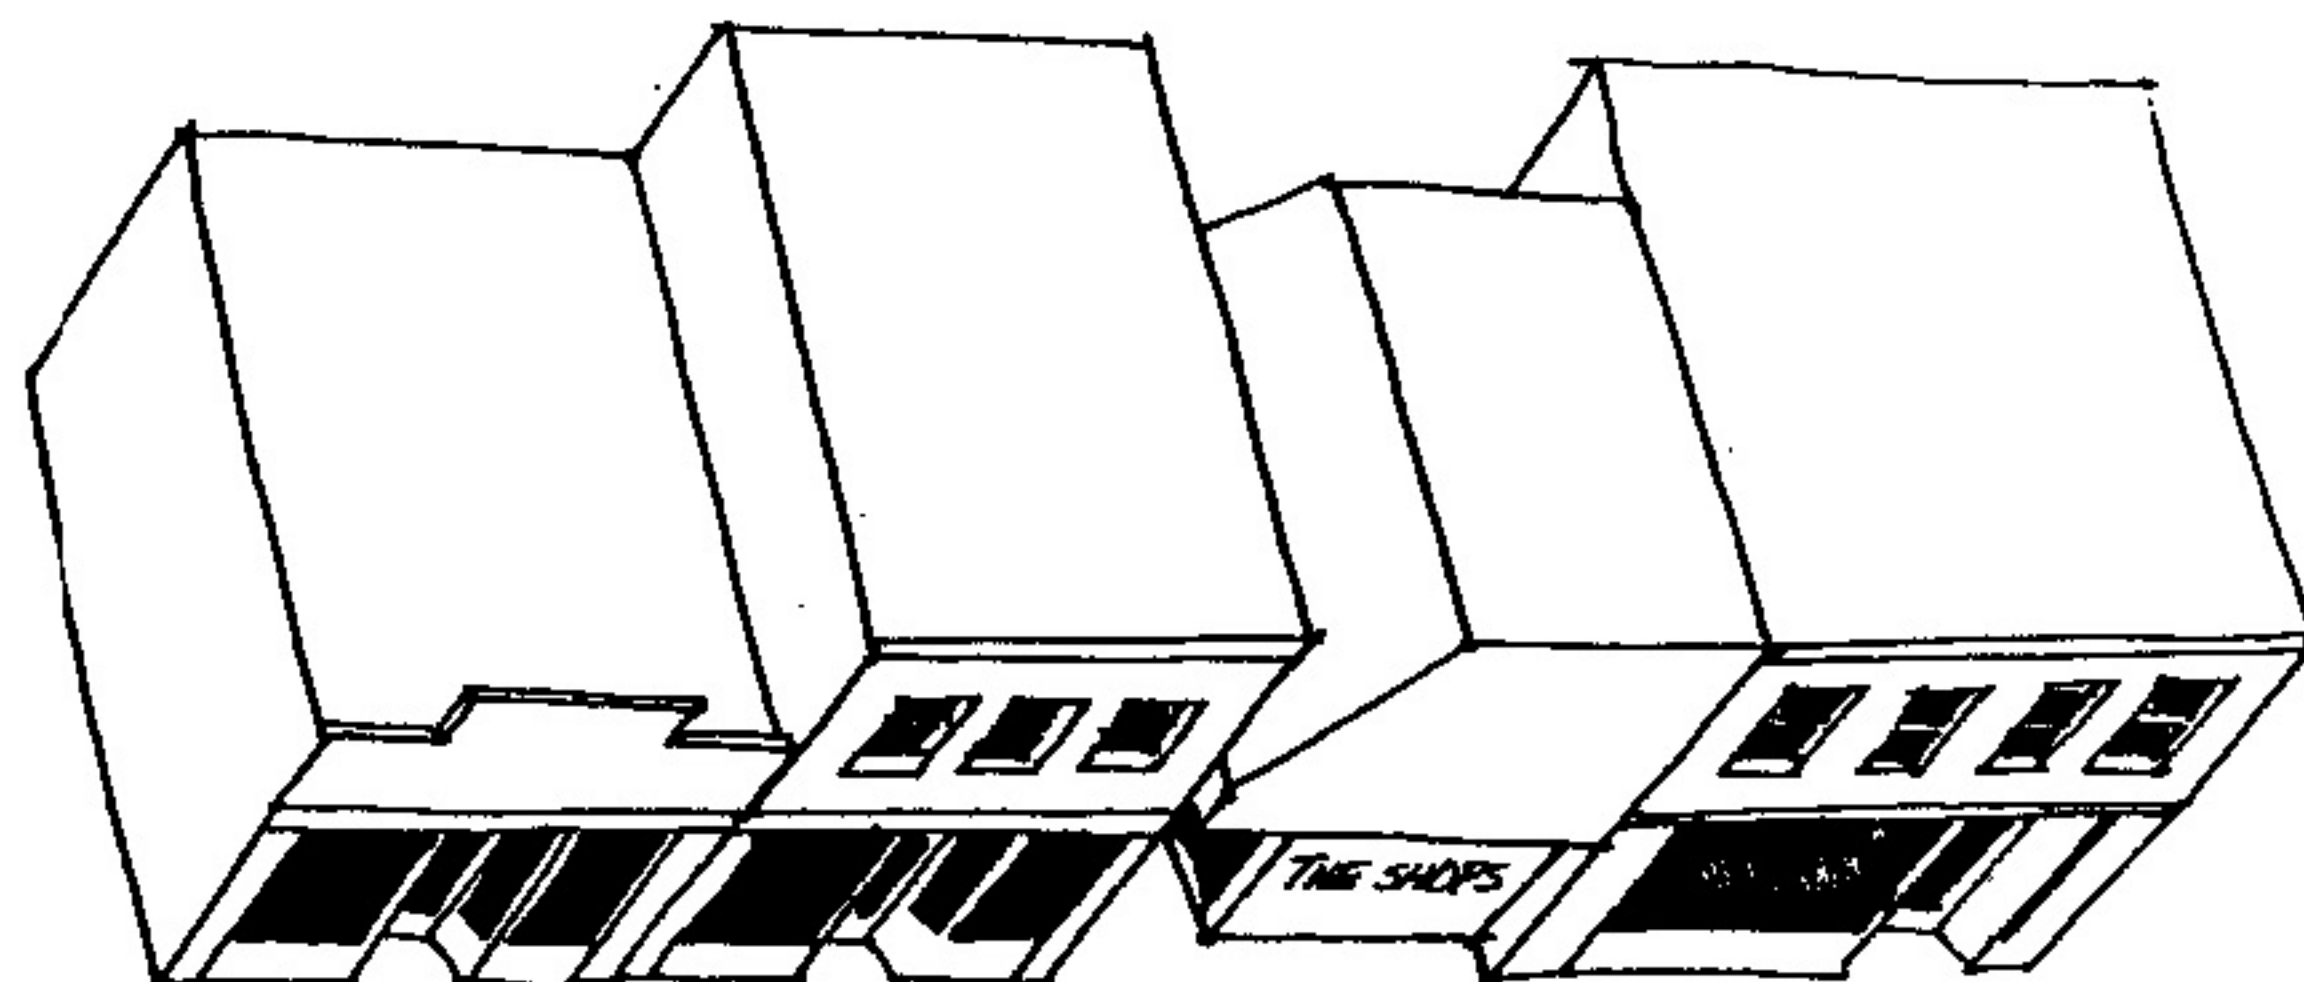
New construction should be oriented to the street and not inward toward itself like "The Shops."
